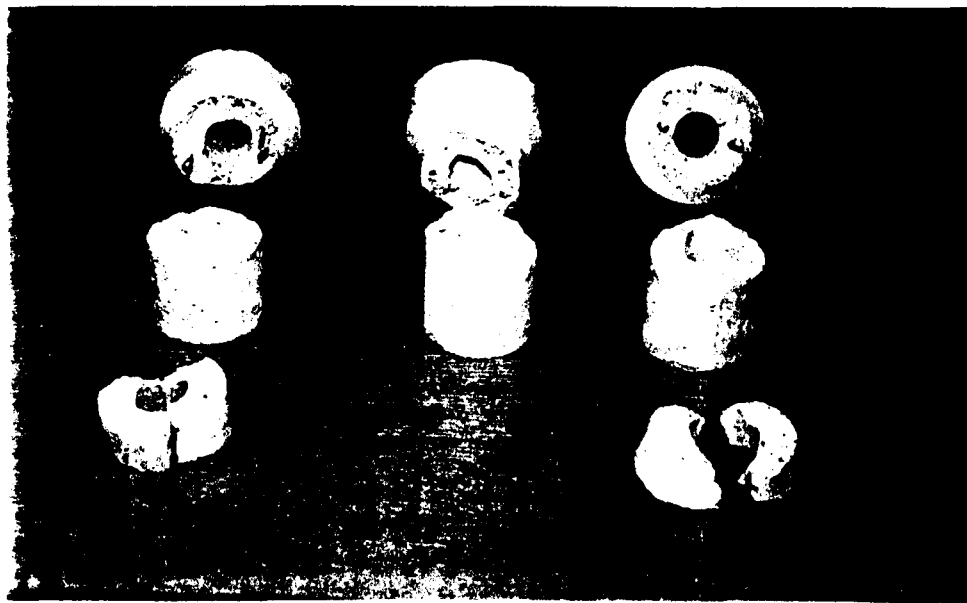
Typical specimen failure when two rebars are used.
